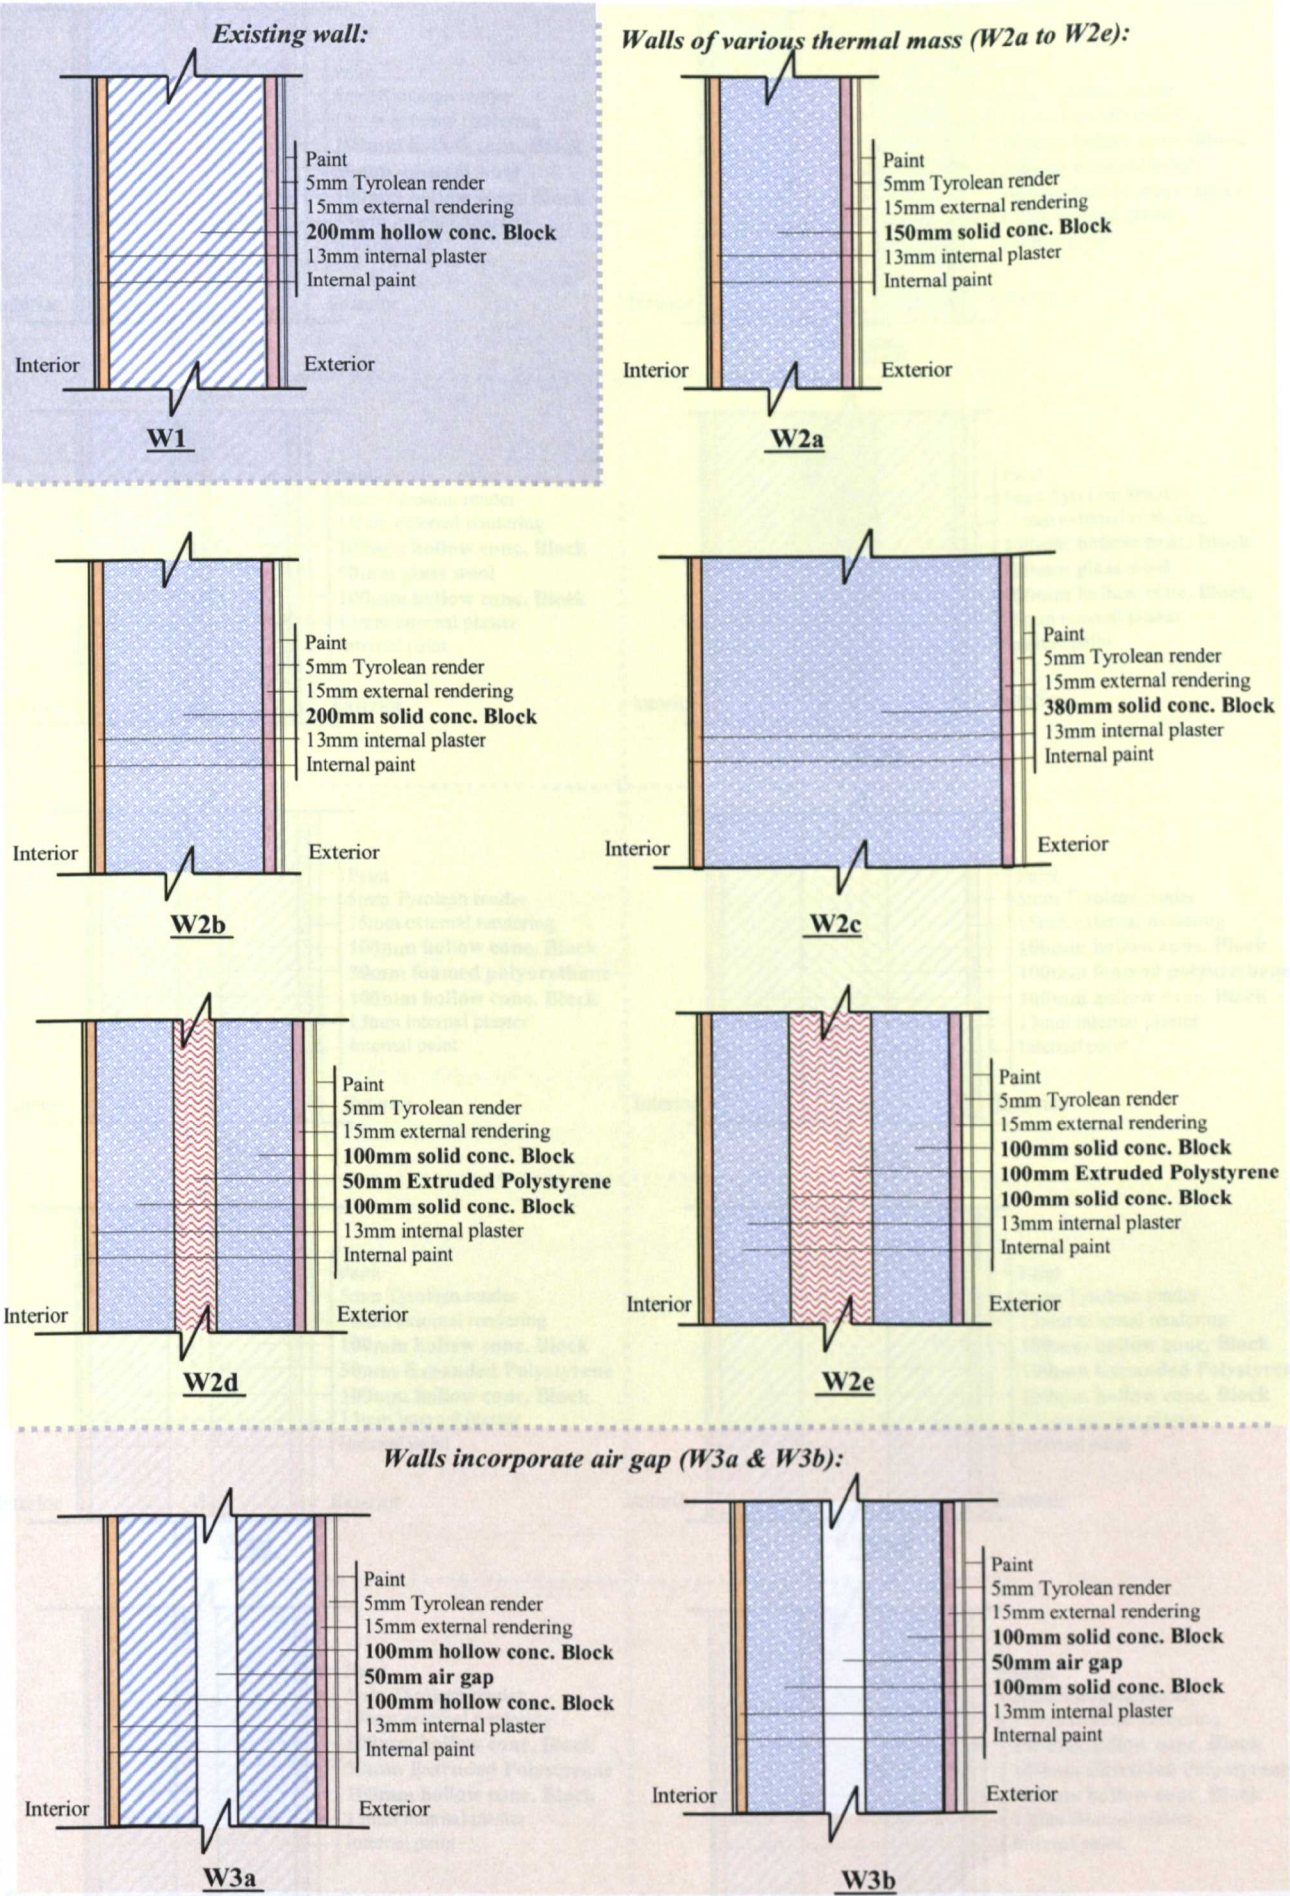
Detailed drawings for existing wall (W1), thermal mass walls (W2a to W2e), and walls with air gap (W3a & W3b)
